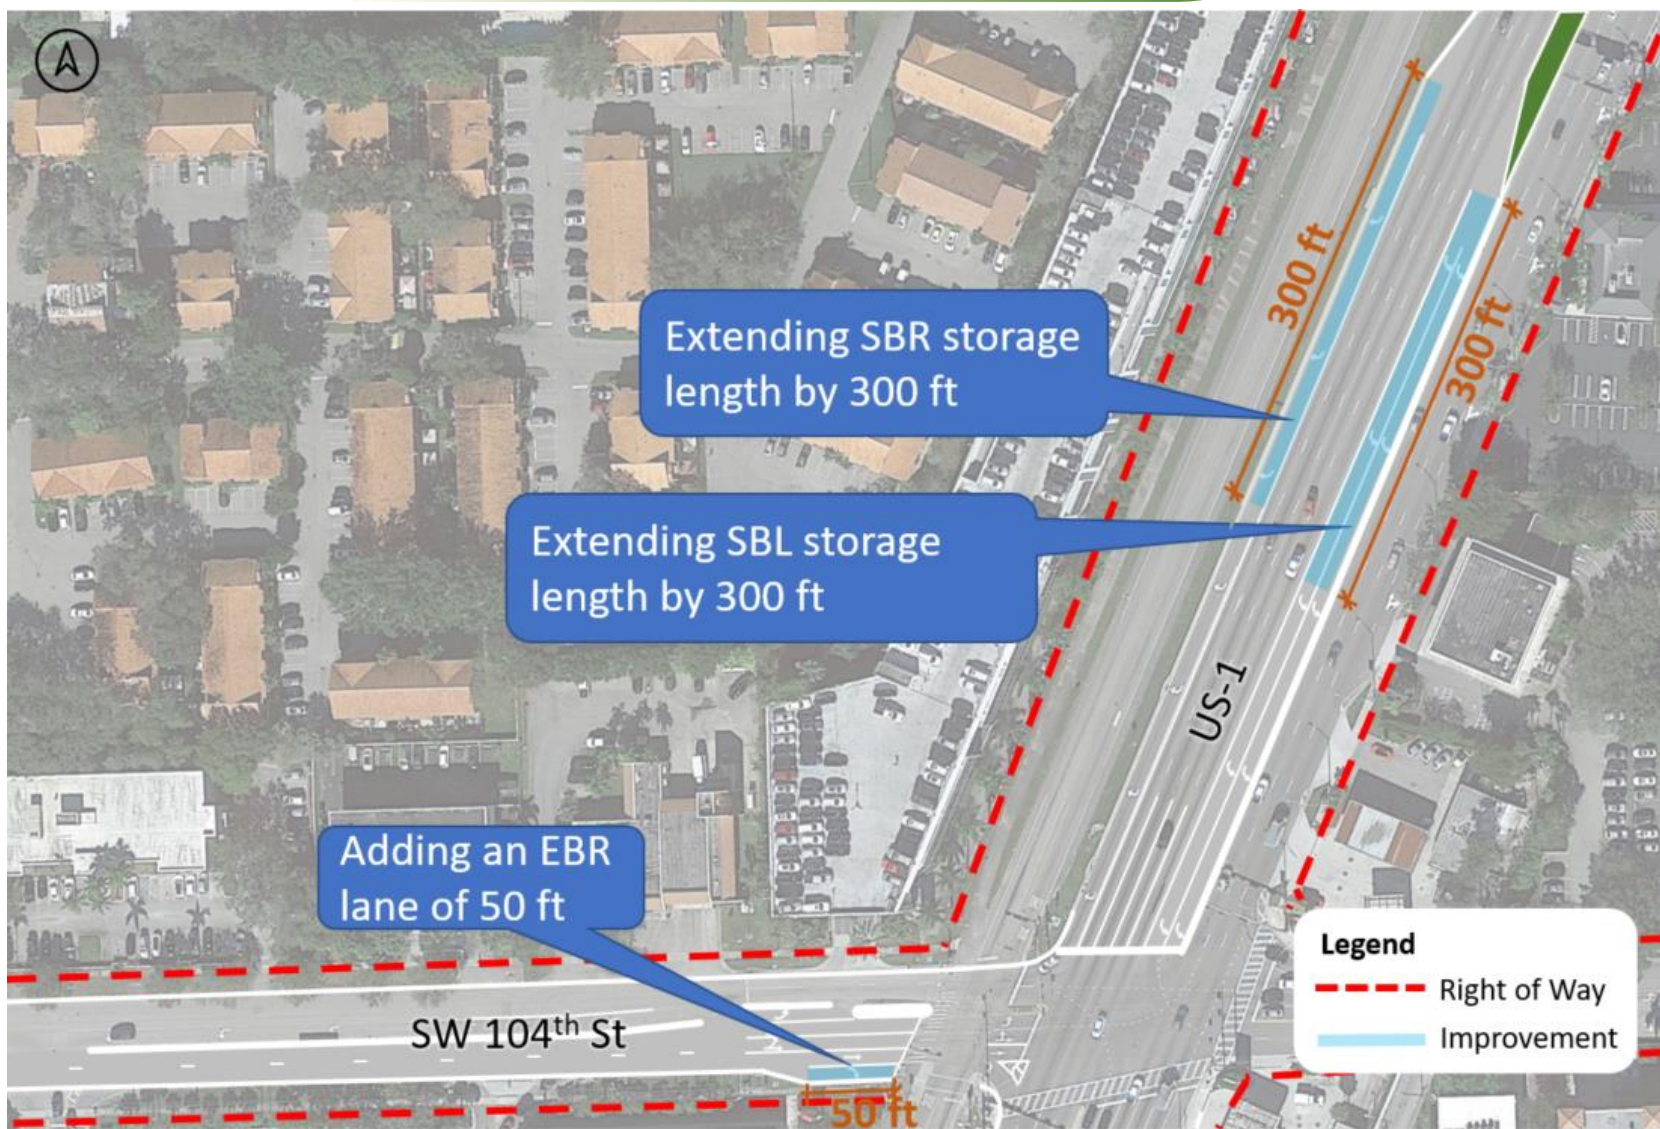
Conceptual Design Plan – US-1 and SW 104th Street
